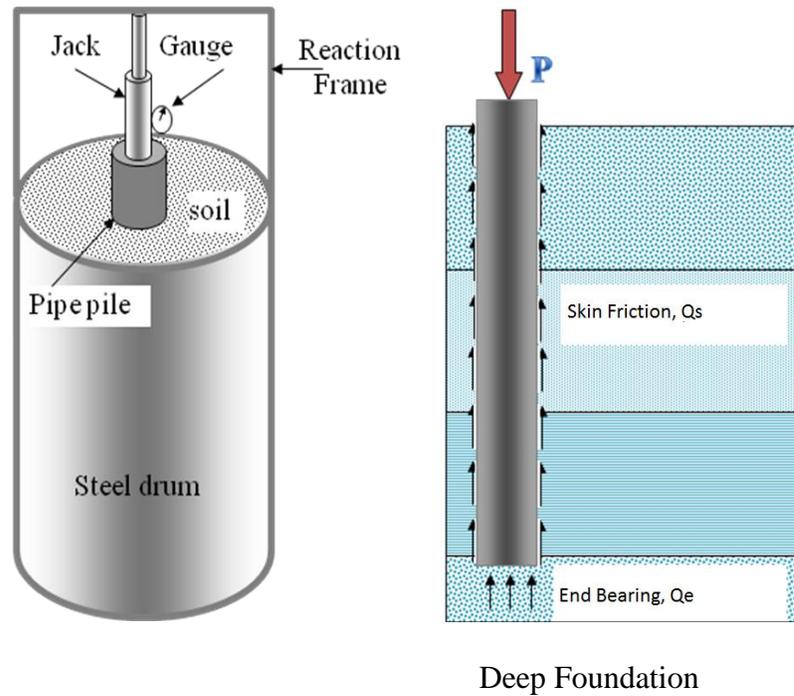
Typical sketch of Piped Pile Load test apparatus.
